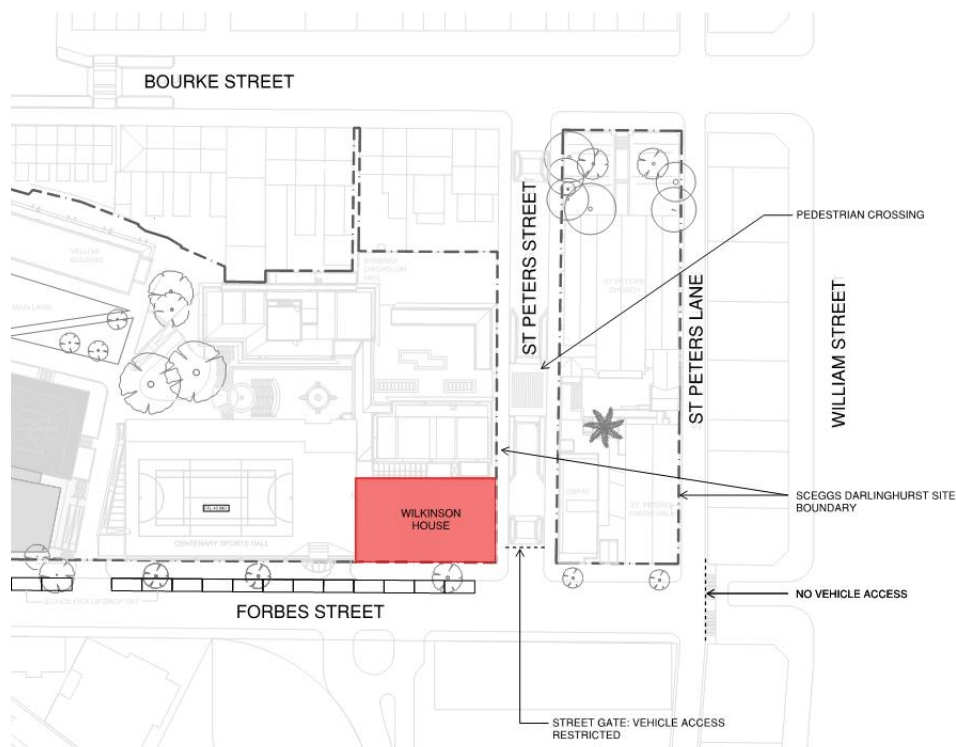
Wilkinson House Site Plan (Image courtesy of TKDA Architects)
